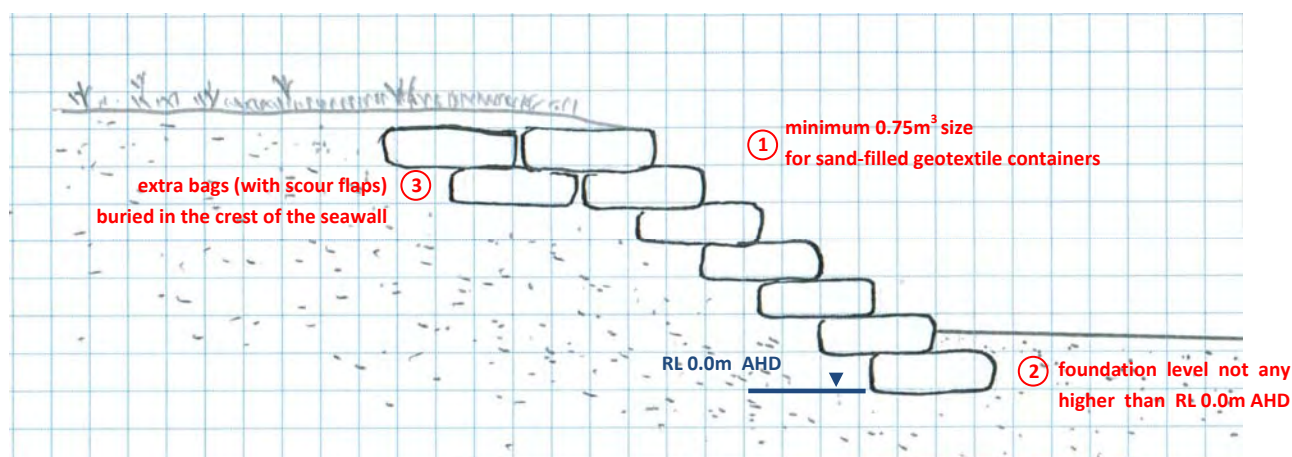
Minimum design standard for seawall construction at Cunggulla
